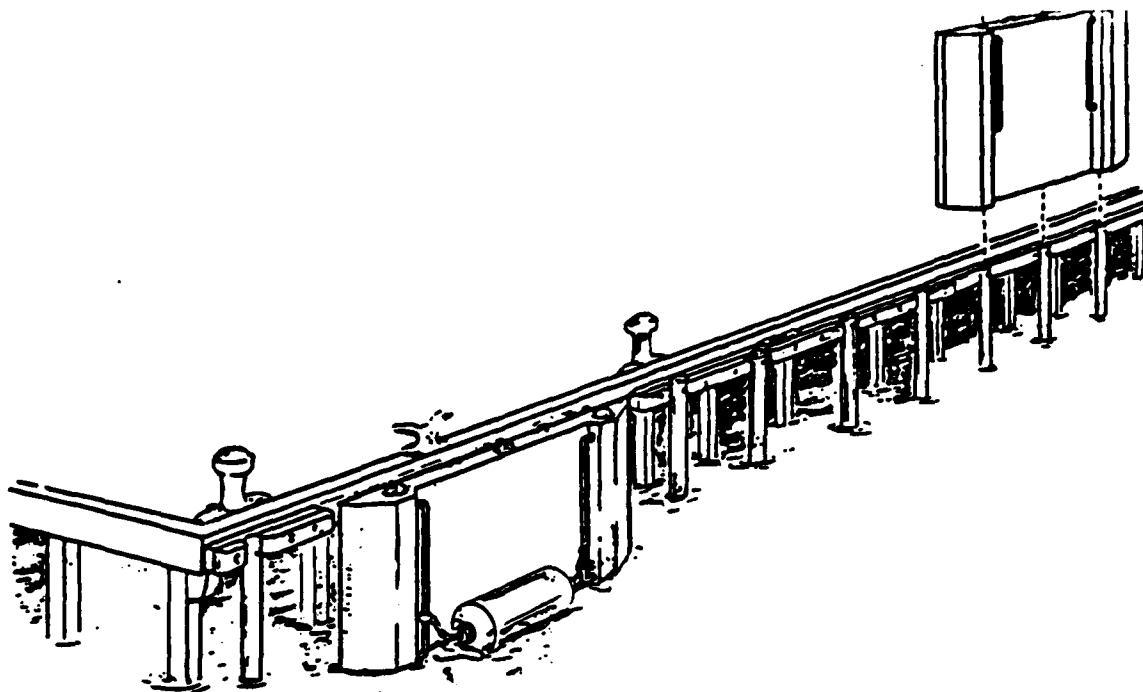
Precast Concrete Bearing Wall for Foam-Filled Fenders.
